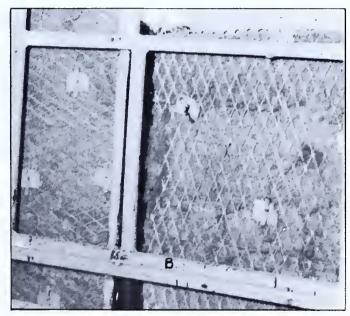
Close-up of Bottom Shell Shoe "B"
